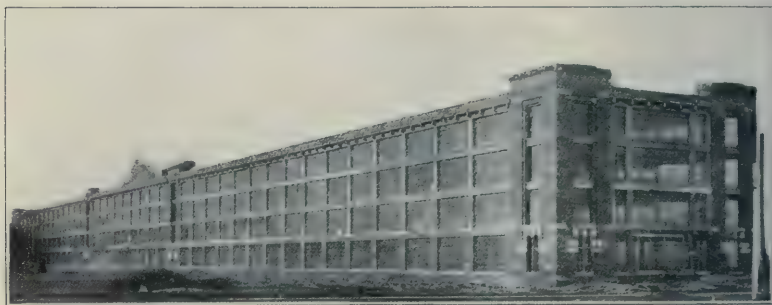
Fig. D. Printing Building, Mushroom System, Philadelphia, Pa.
